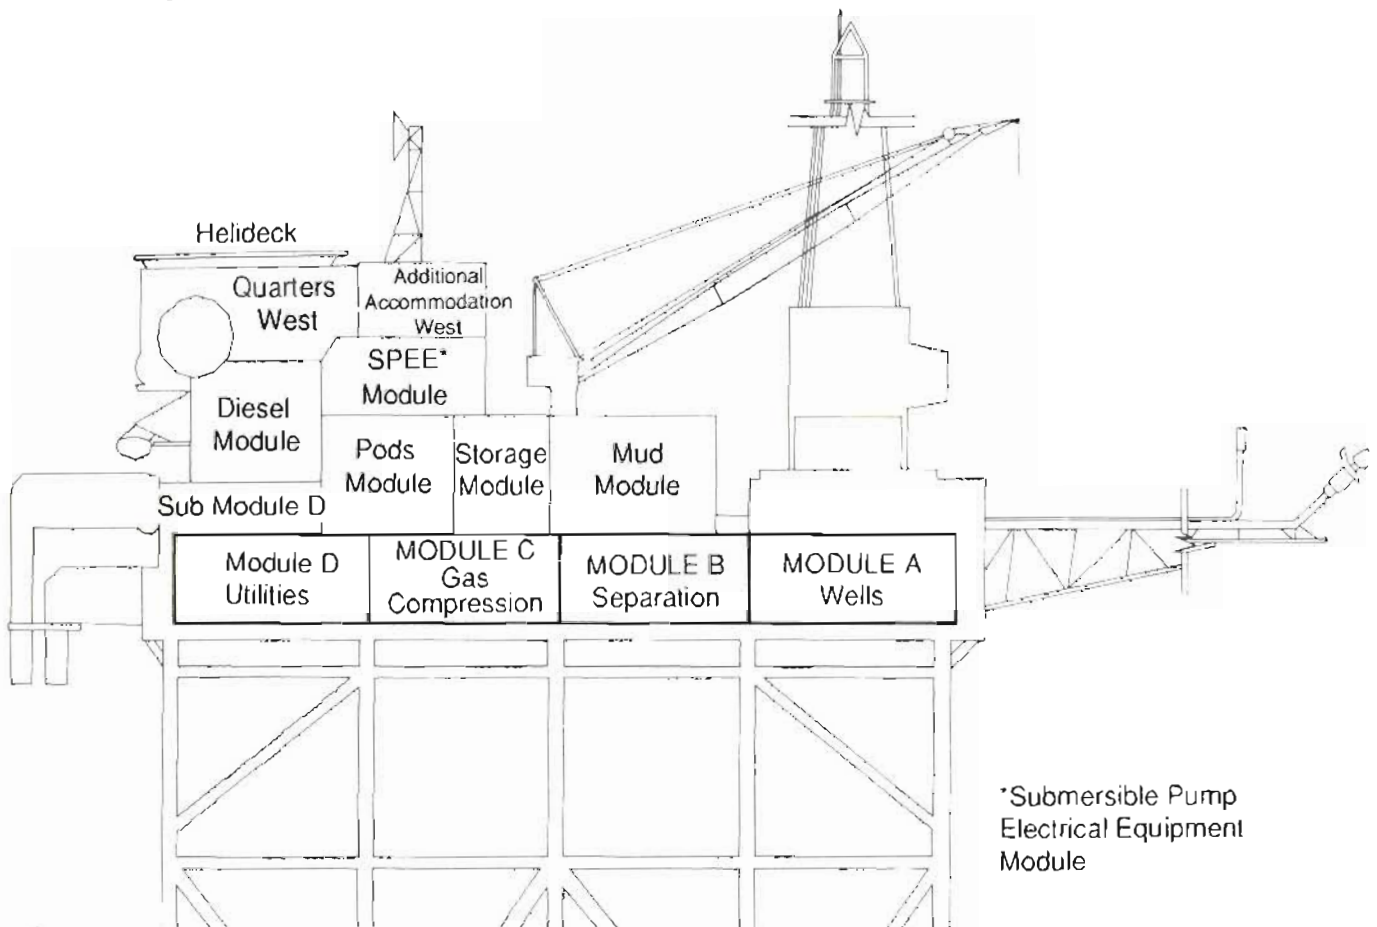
The Piper Alpha platform: west elevation (simplified).
